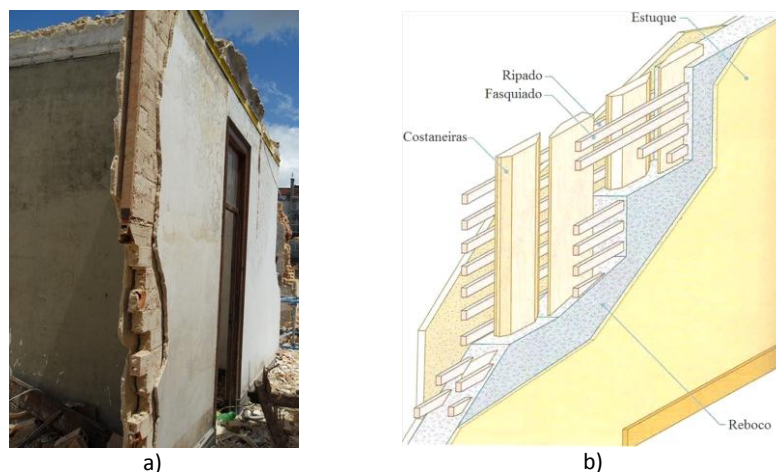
Interior walls. a) Interior wall made with brick masonry; b) Lath and plaster walls (Appleton J. , 2003)
